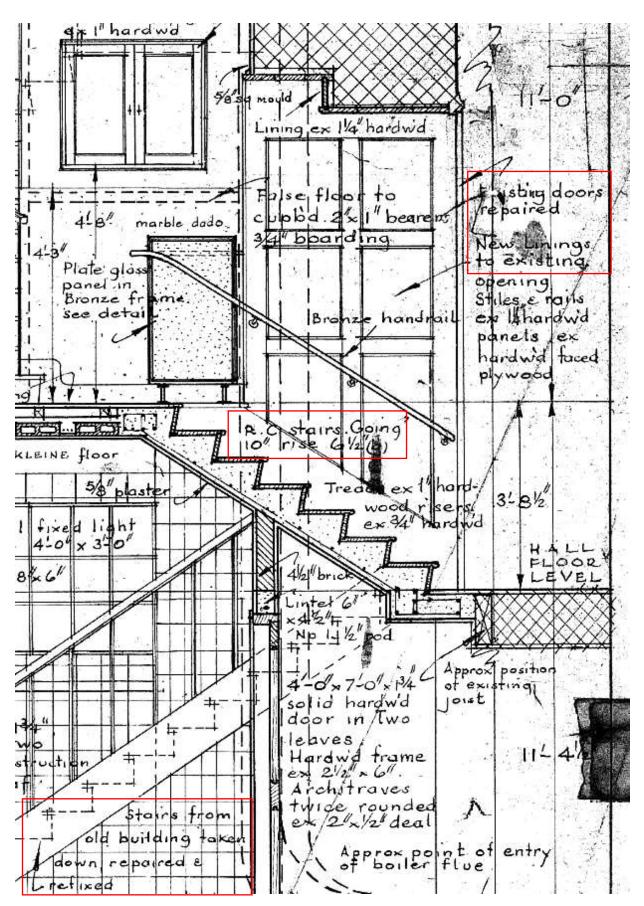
Proposed Stationers' Hall Court Room Block, Henry Dawson, February 1952. Note the 'Existing doors repaired' and 'New linings to existing opening'. The steps are clearly new, formed in reinforced concrete. Stairs from basement to Hall are labelled: 'Stairs from old building taken down, repaired and refixed'.
